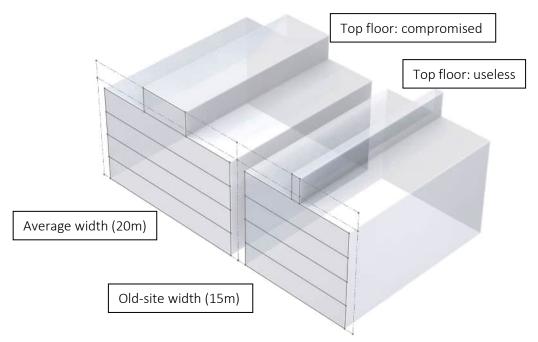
Front-of-site maximal build envelopes for HRZ to 14m height. LEFT: average, 20m wide site and RIGHT: typical pre-1970 site (15m width). Height limit and setback above 12m only allows for \sim 2.8m floor separations on average, and a (sometimes very) compromised 5th floor.
